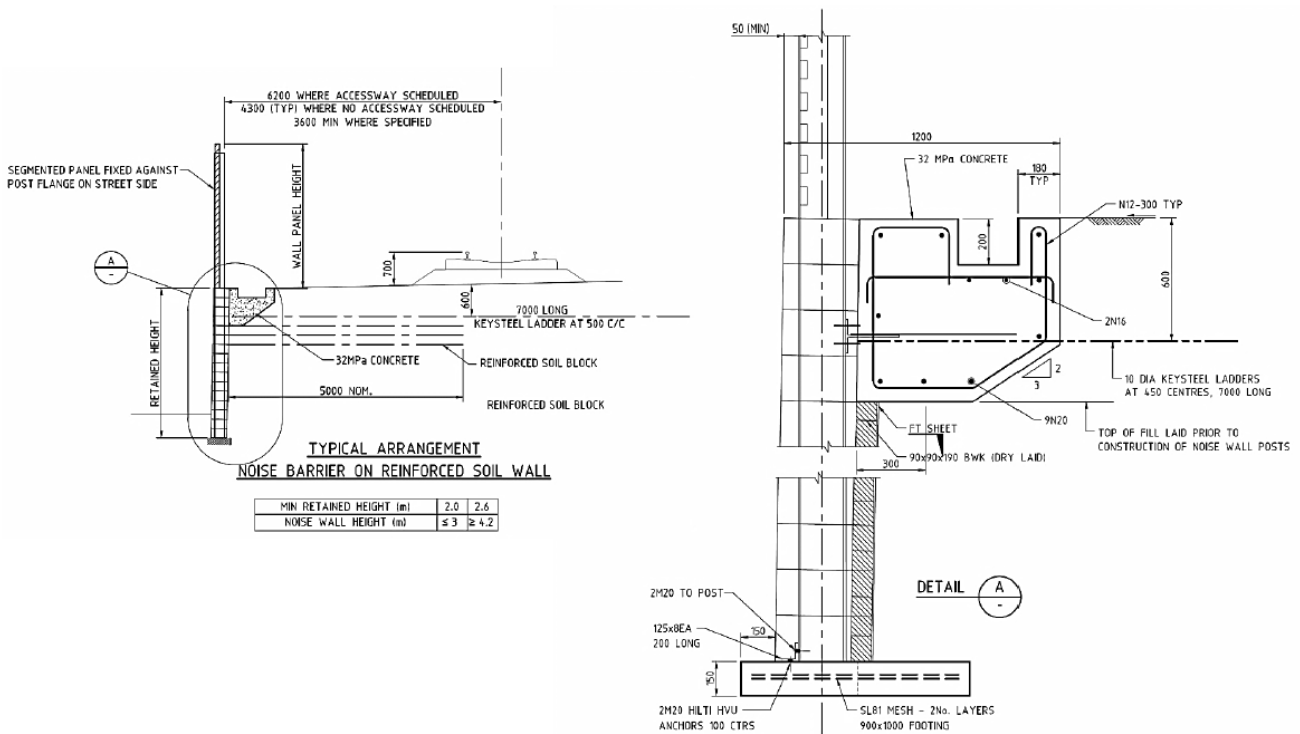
Accommodation of Noise Barrier Posts in a high reinforced Soil wall with Restraint from a Top Fixing
